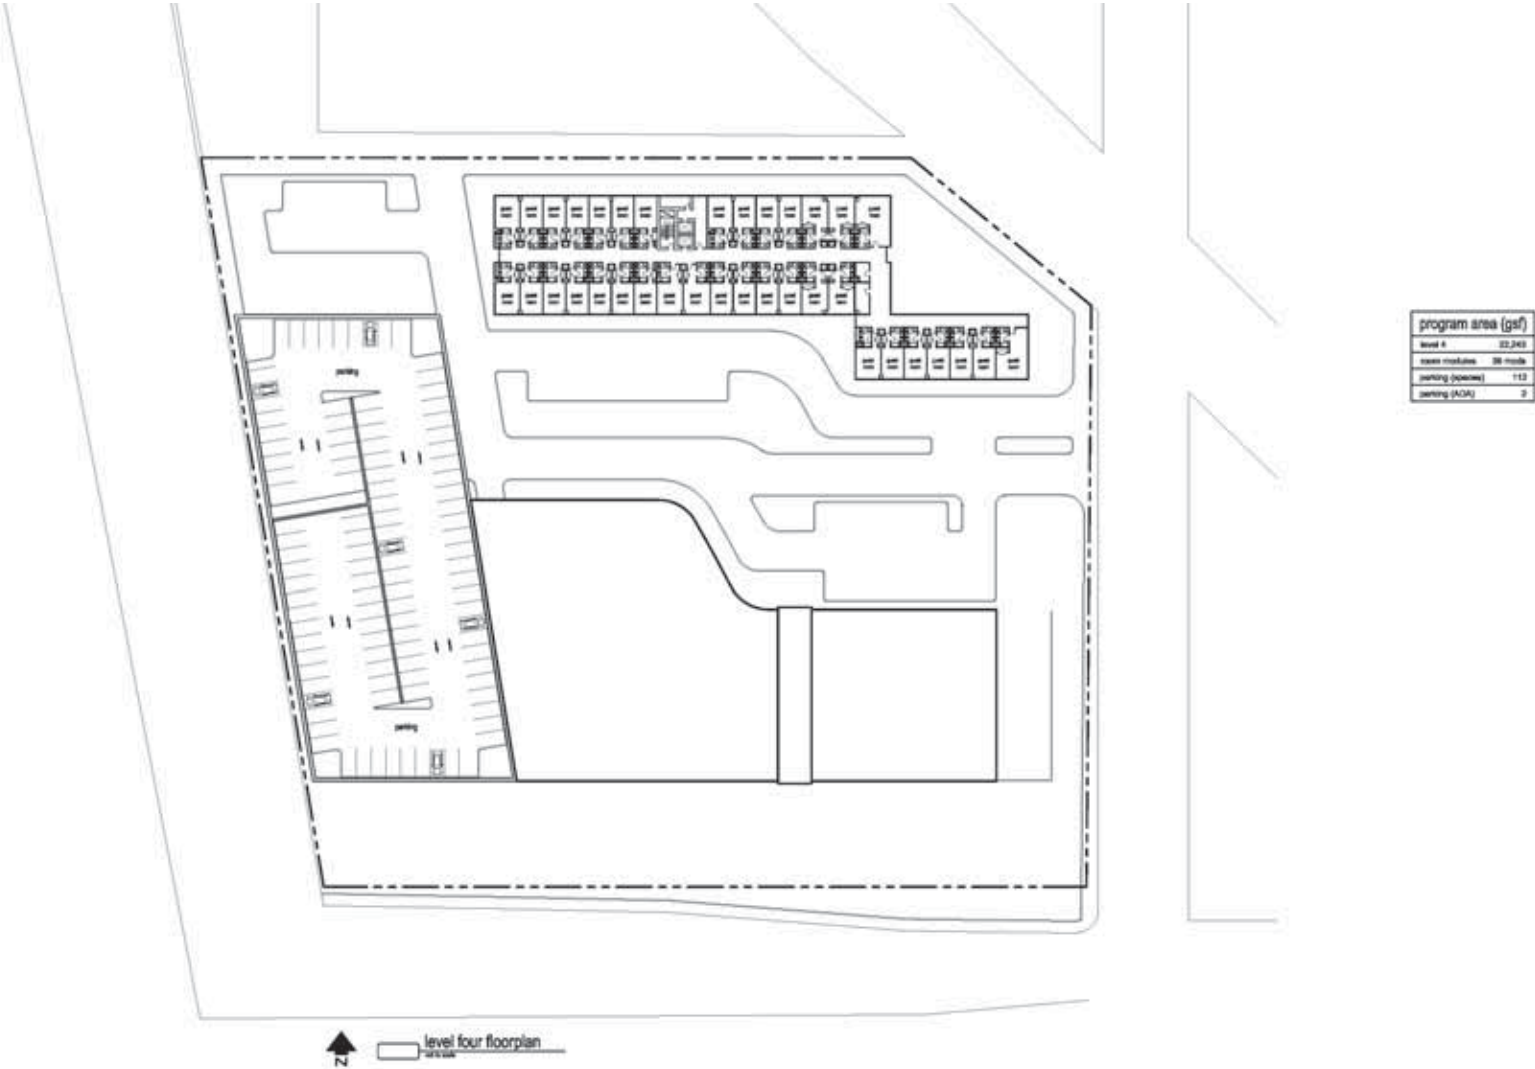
EXHIBIT B: LEVEL 4 FLOOR PLAN (HOTEL ROOMS)
